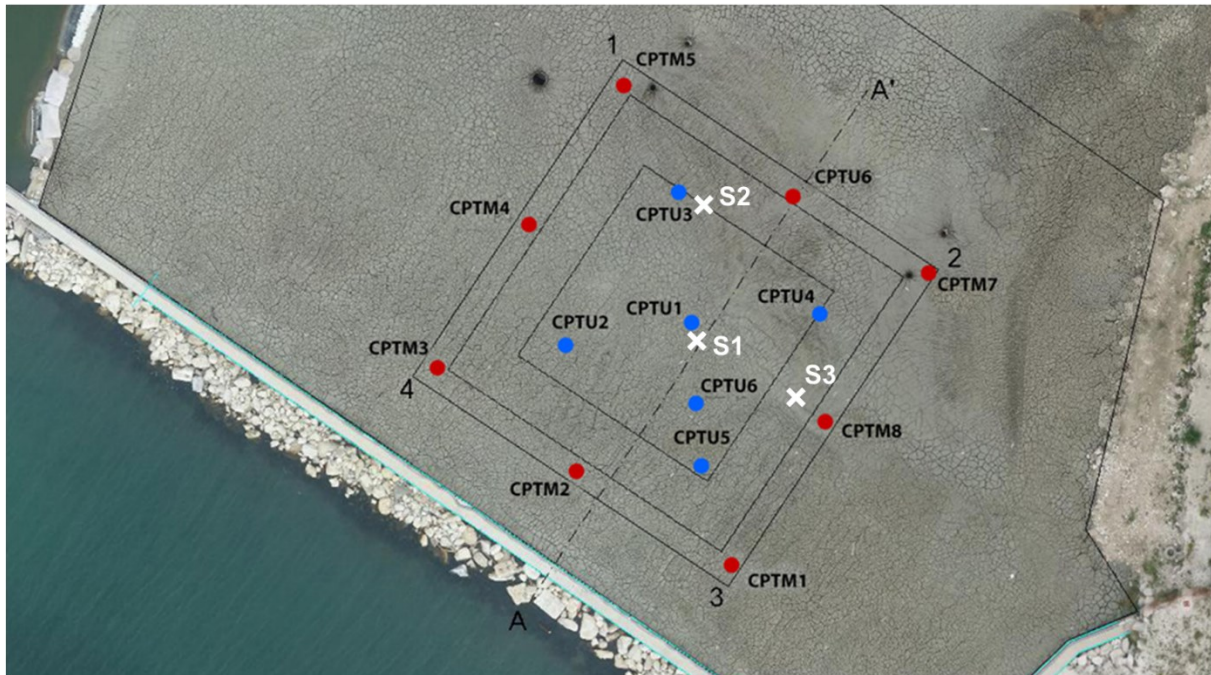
Planimetric layout of in situ tests performed post operam.
